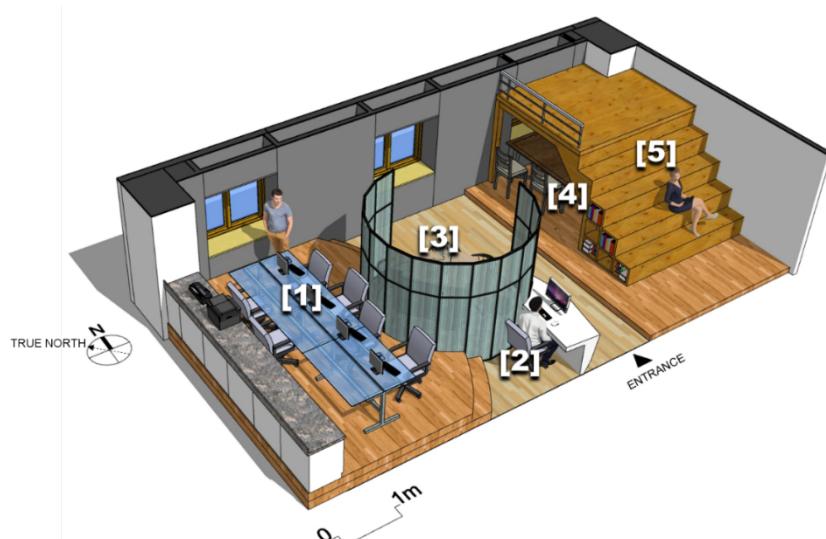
Isometric Diagram of the New Floor Plan. [1] Work Area; [2] Reception; [3] Meeting Room;
